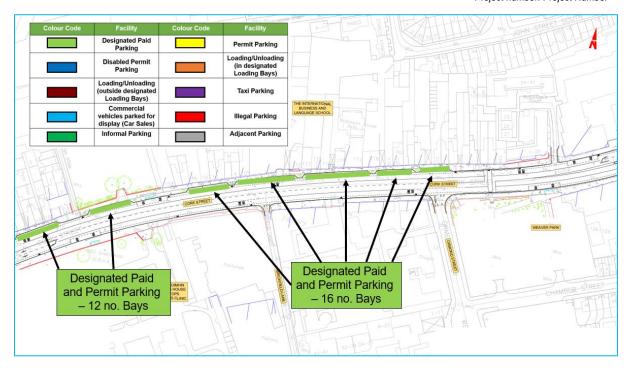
Cork Street Existing Parking – Marrowbone Lane to Ormond Street
